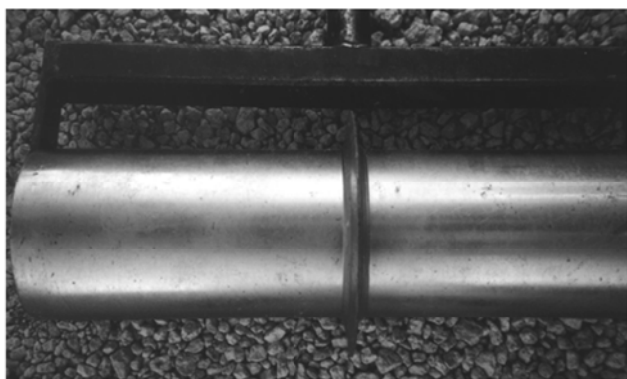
Detailed view of jointing tool for pervious concrete.
